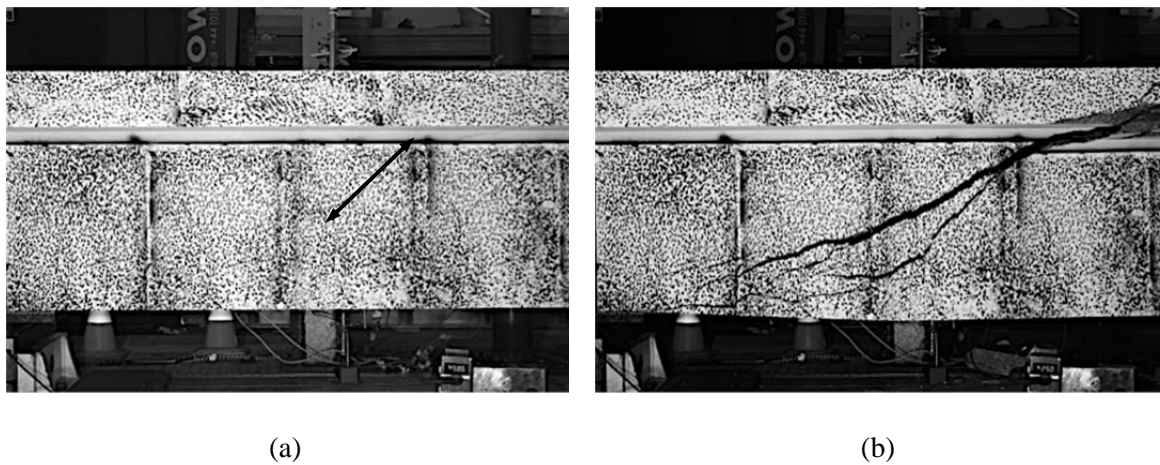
Specimen LBC during testing: (a) initial crack inclination, (b) failure.
